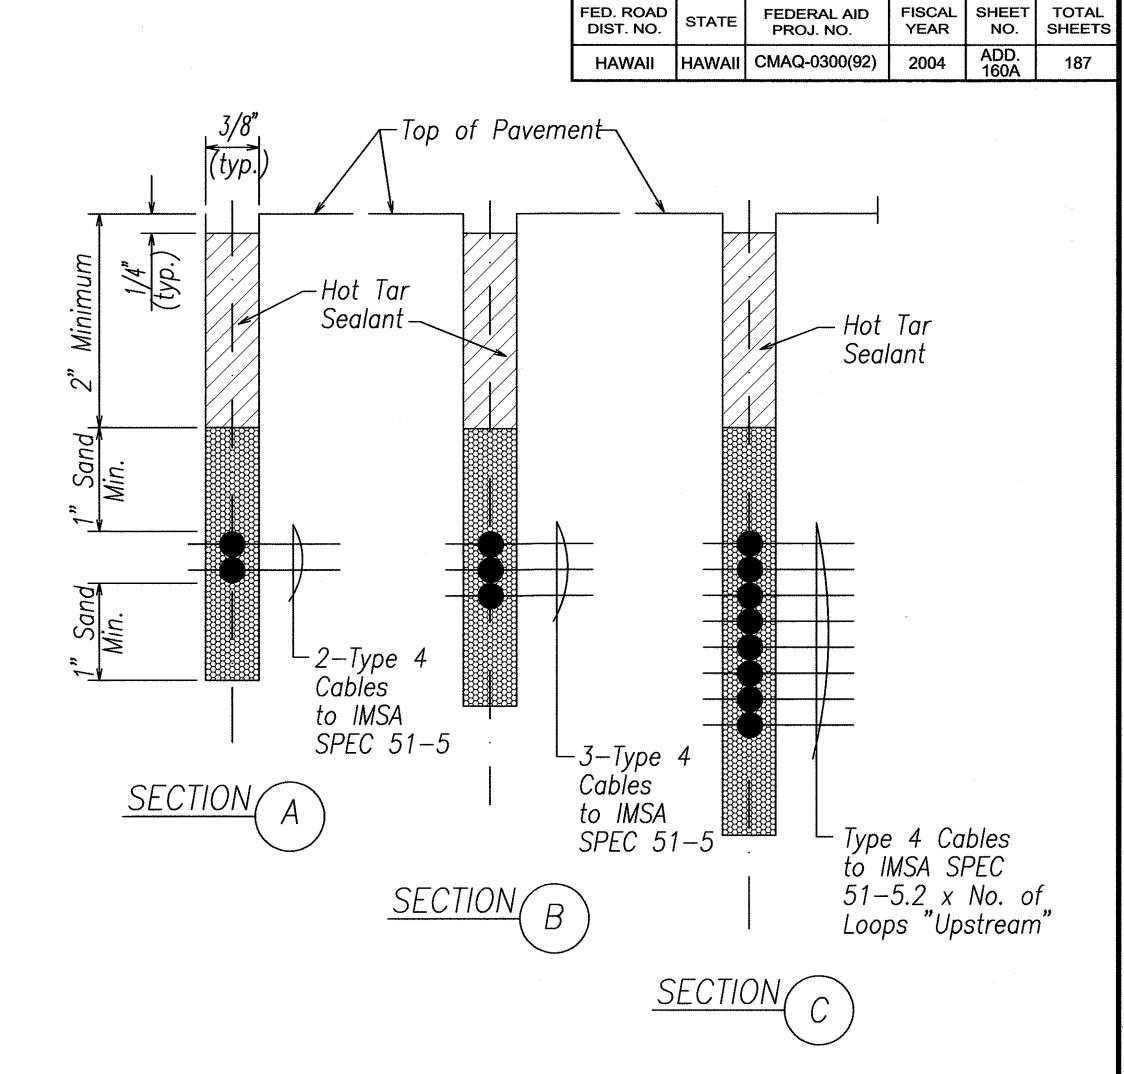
DETAIL OF SENSOR LOOP INSTALLATION AT EDGE OF ROADWAY
